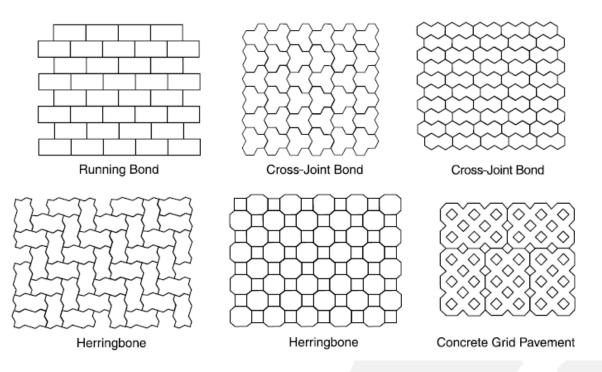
Various patterns for installation of permeable concrete pavers (Interlocking Concrete Pavement Institute, 2004)
